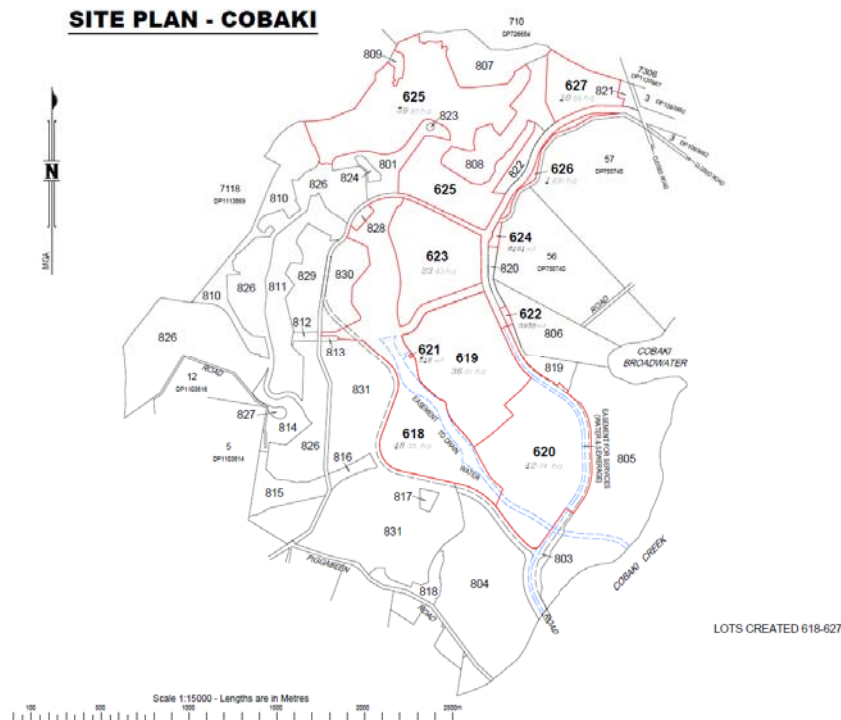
Plan 6400-308 residue lot subdivision of Precincts 6 & 7 created by the Project Approval subdivision
